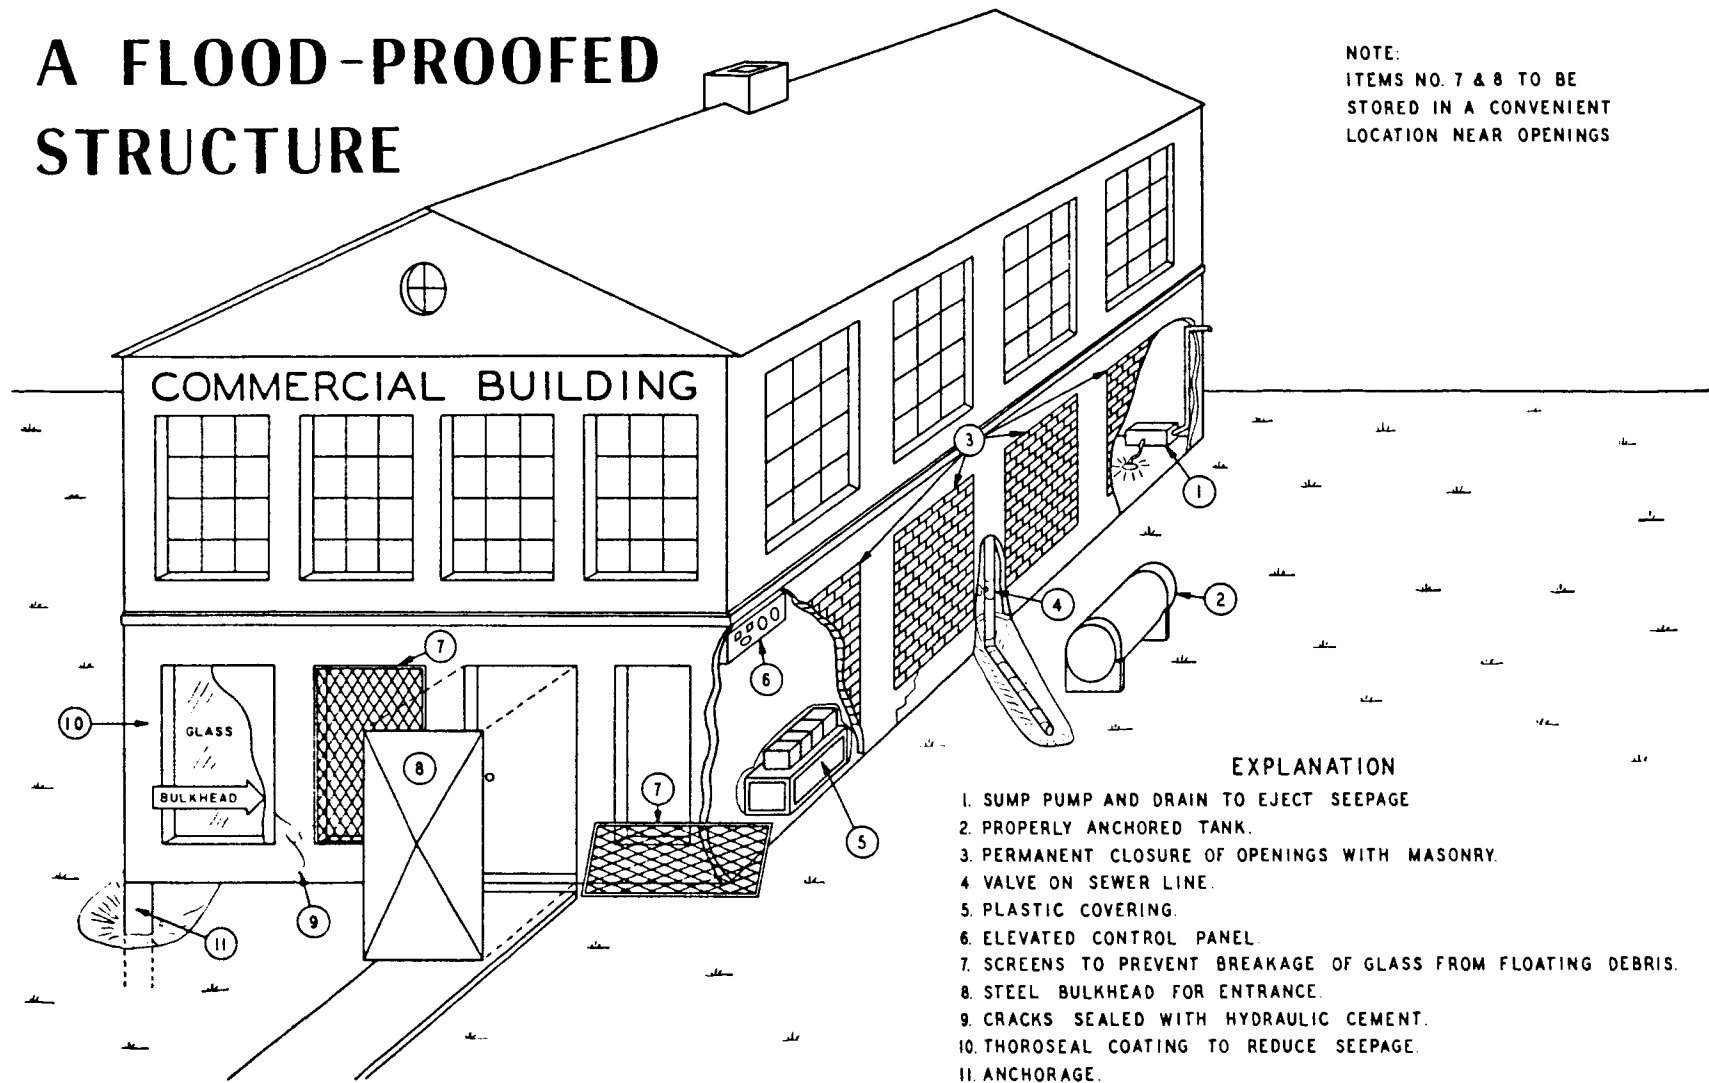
An illustration of typical flood-proofing measures. (After Corps of Engineers.)
